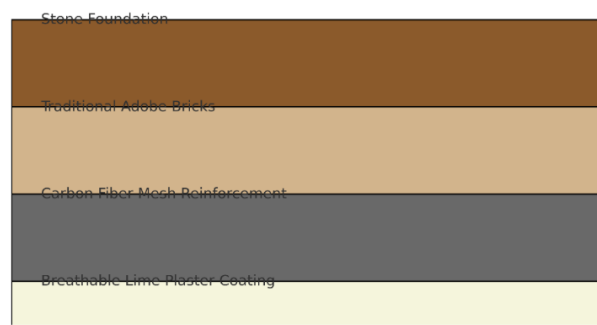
Cross-sectional diagram showing hybrid reinforcement of mud-brick wall
